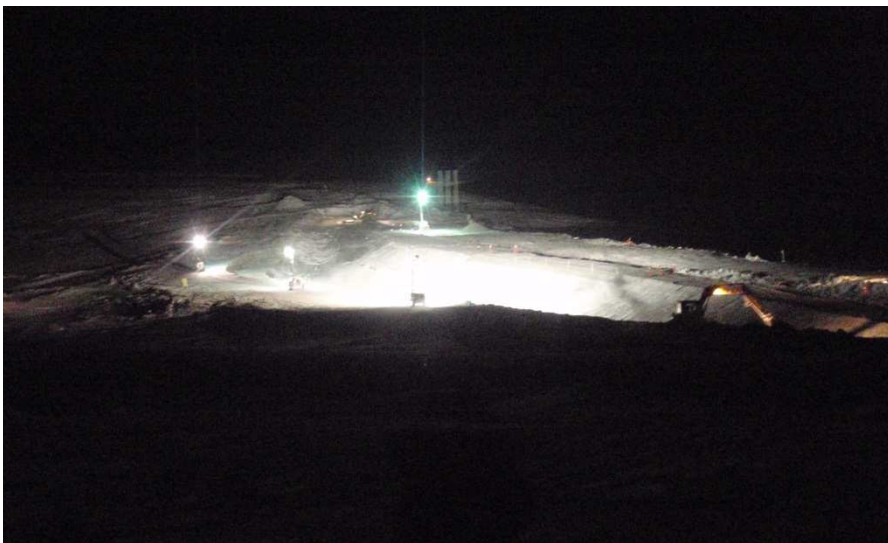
~ E view of North Dam area. Taken from outside the FCP Pad.
